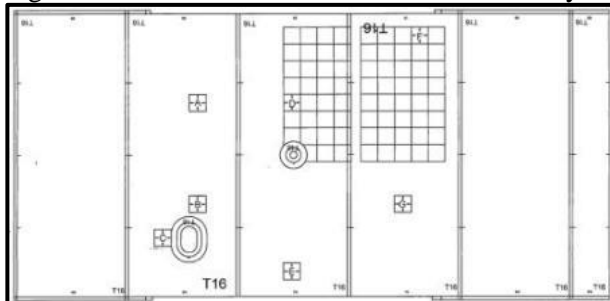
Tank 19 Measurement Panel Layout
